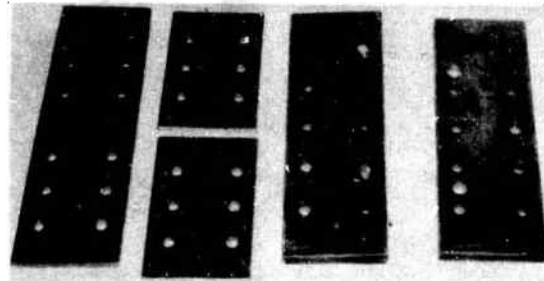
PLATES USED IN JOINT (SECONDARY UNIT)
